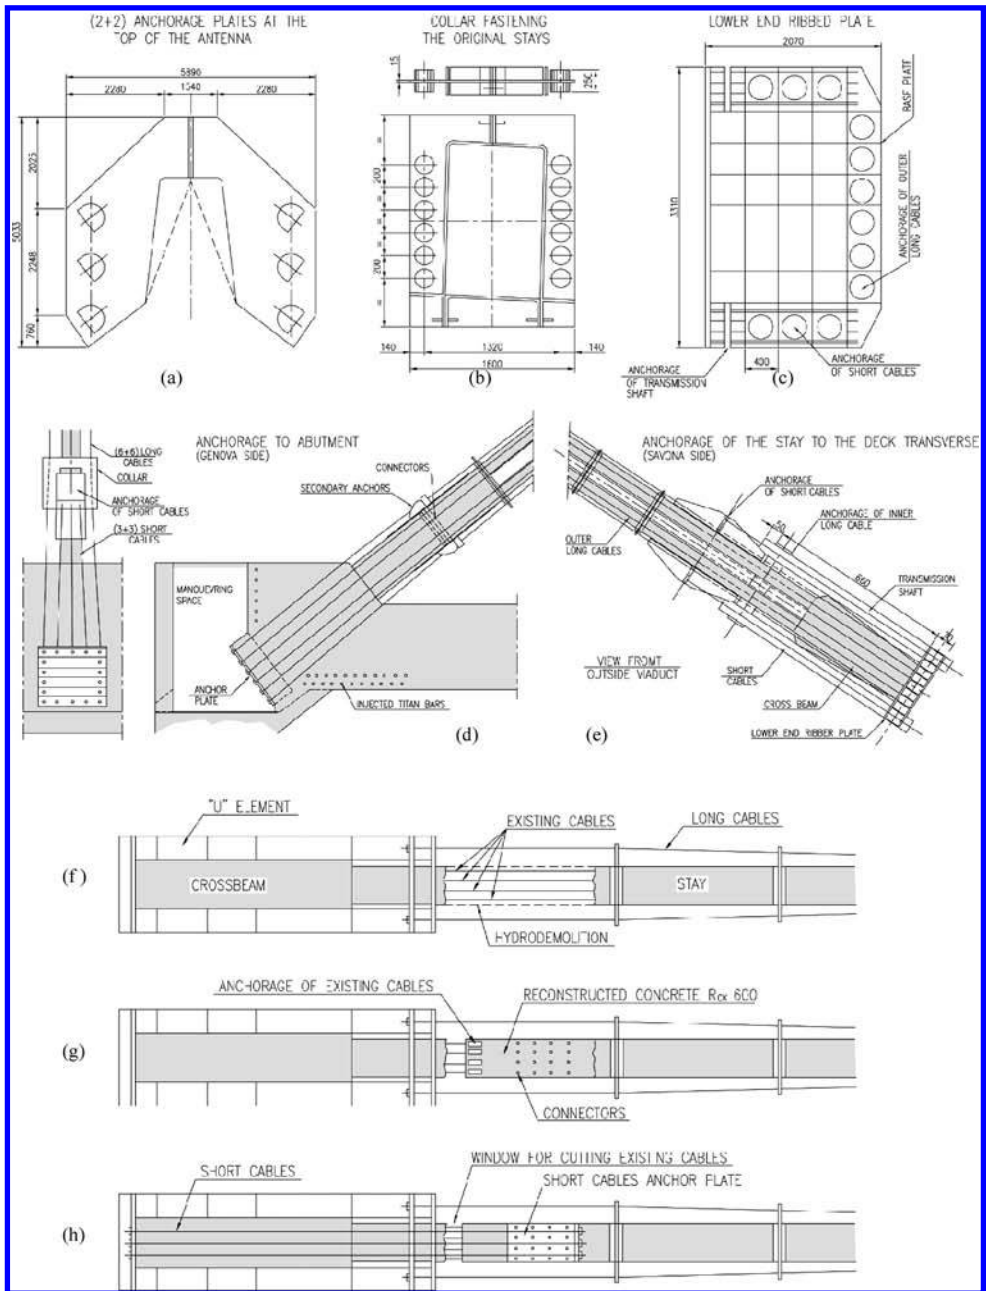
Polcevera Bridge (1960–64). (a) anchorage plates at the top of the antenna; (b) collar fastening the original stays; (c) lower end ribbed plate; (d) anchorage of the tie to the abutment; (e) anchorage of the stay to deck transverse; (f), (g), (h) phases of demolition and of reconstruction of the end zones of the ties.
